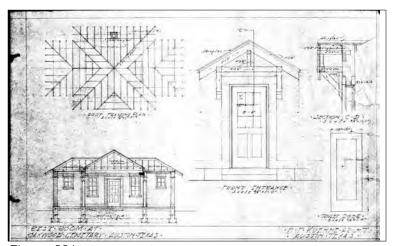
Oakwood Cemetery Annex gate house construction drawings, detail (City of Austin)
